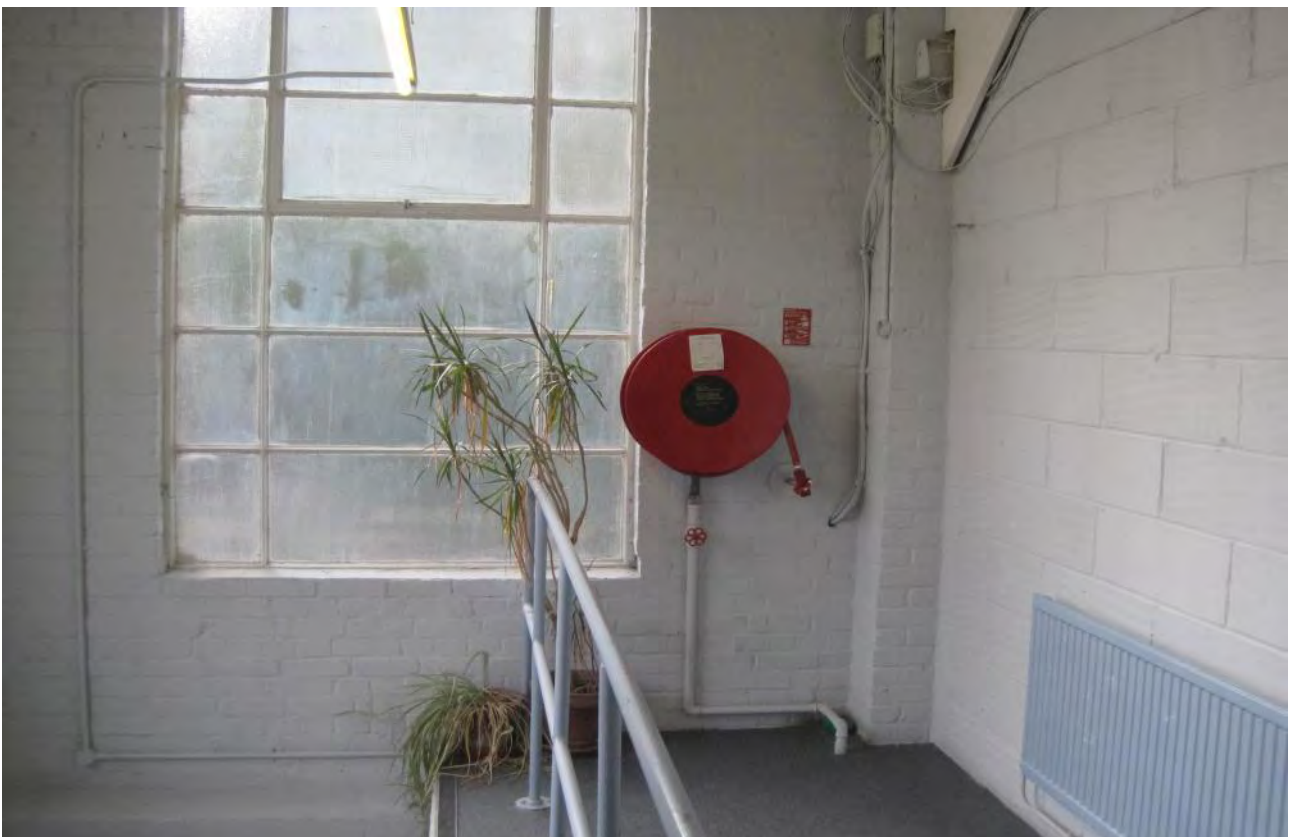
Large single glazed window to 1<sup>st</sup> floor of Building C
